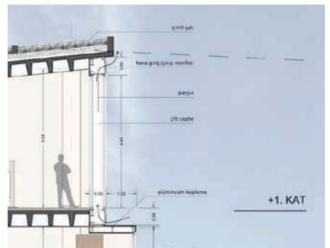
Turkcell R&D building, double facade detail (URL [4])
